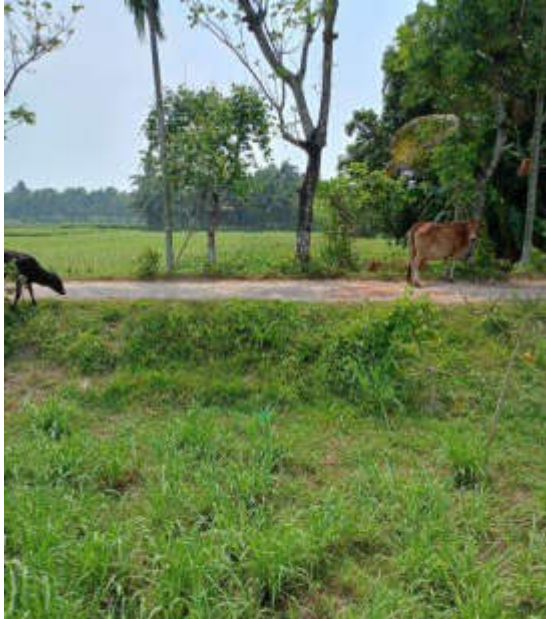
Existing condition of road under scheme # 4 at ward # 5
